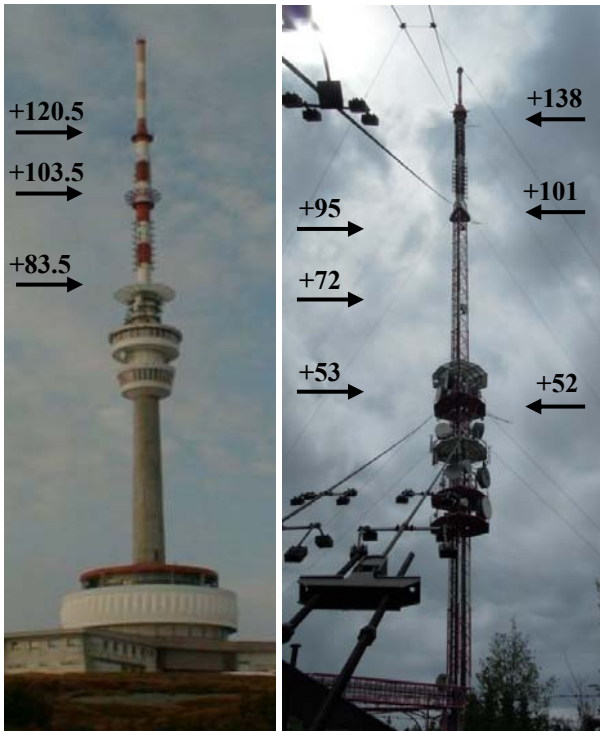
Praděd tower and the guyed mast at Javořice, elevations of sensors
